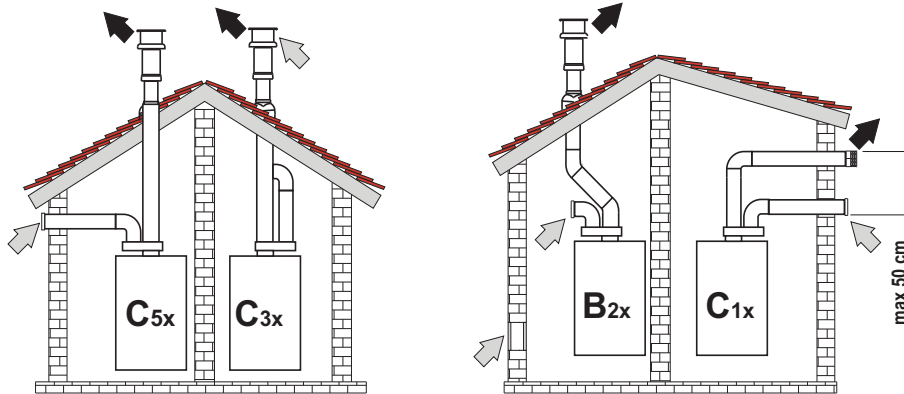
Examples of connection with separate pipes (⇨ = Air / ⇨ = Fumes)
